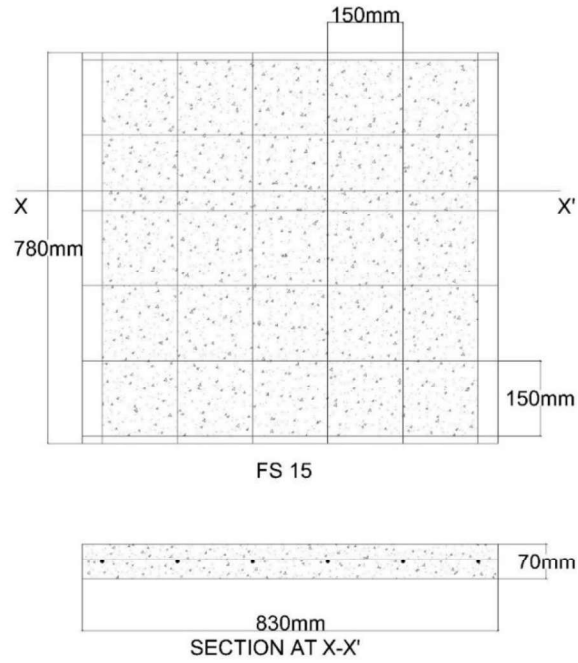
Reinforcement Details of 150 mm spacing specimen
